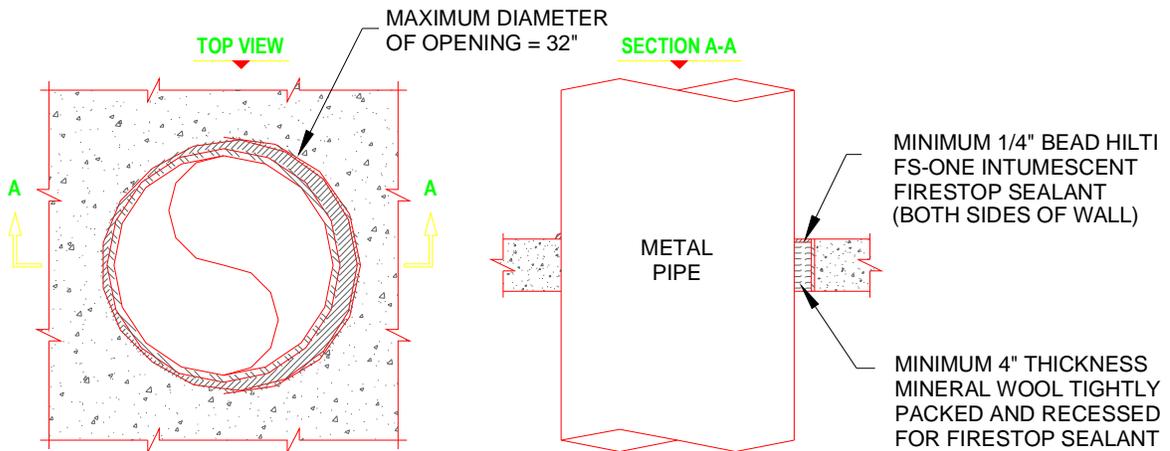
BUILDING SERVICES WALL OPENING FIRE STOPPING
